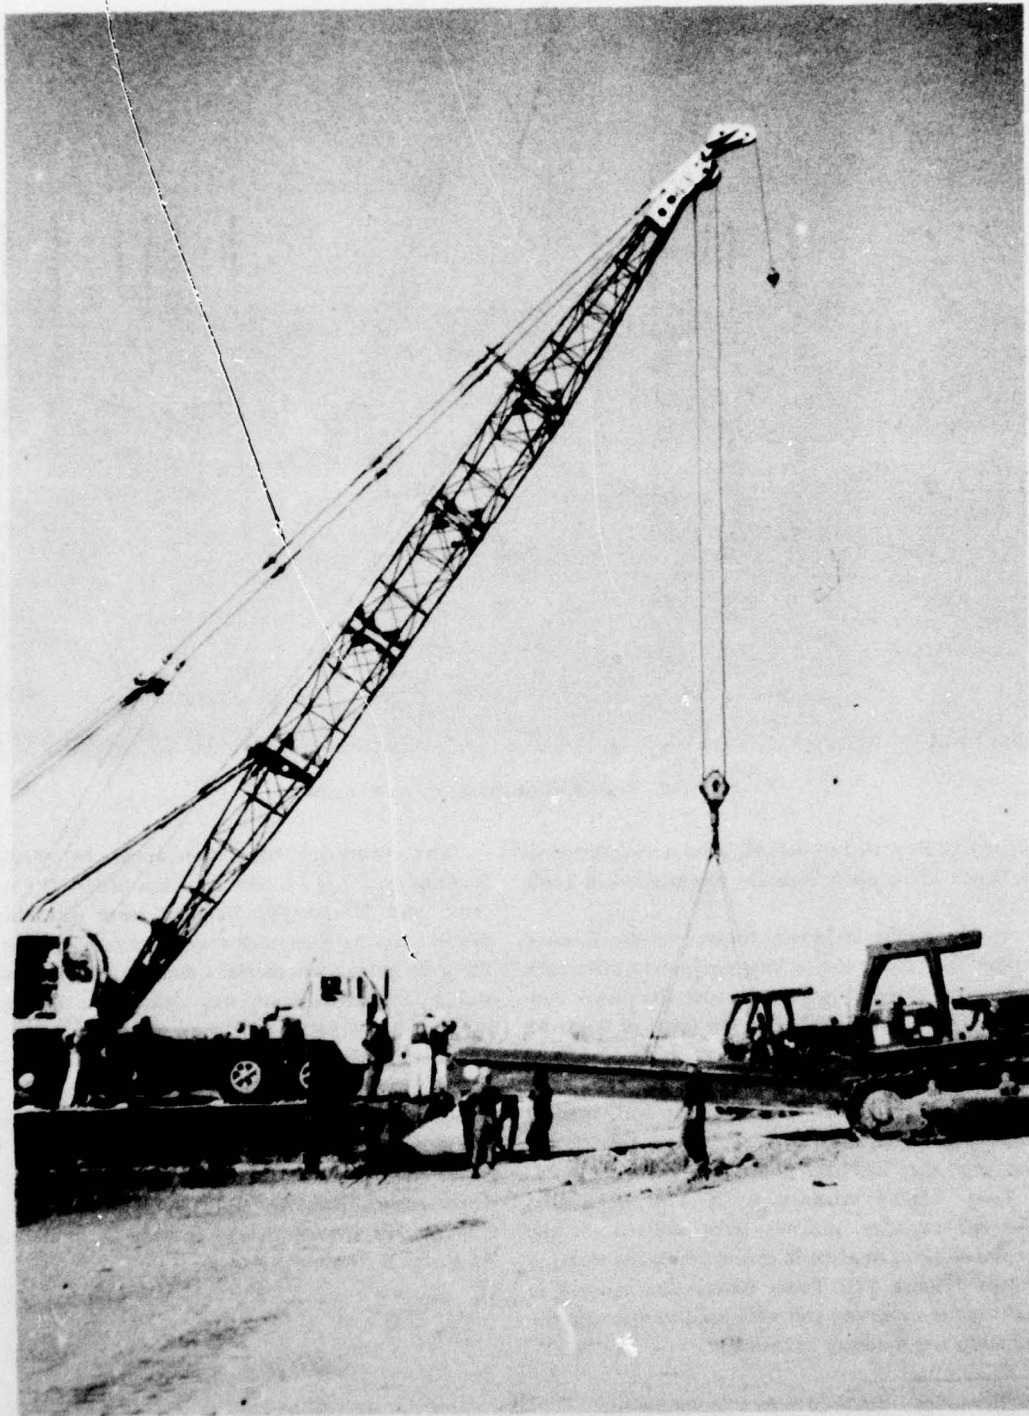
Truck crane positioning beach ramps prior to pier construction.
